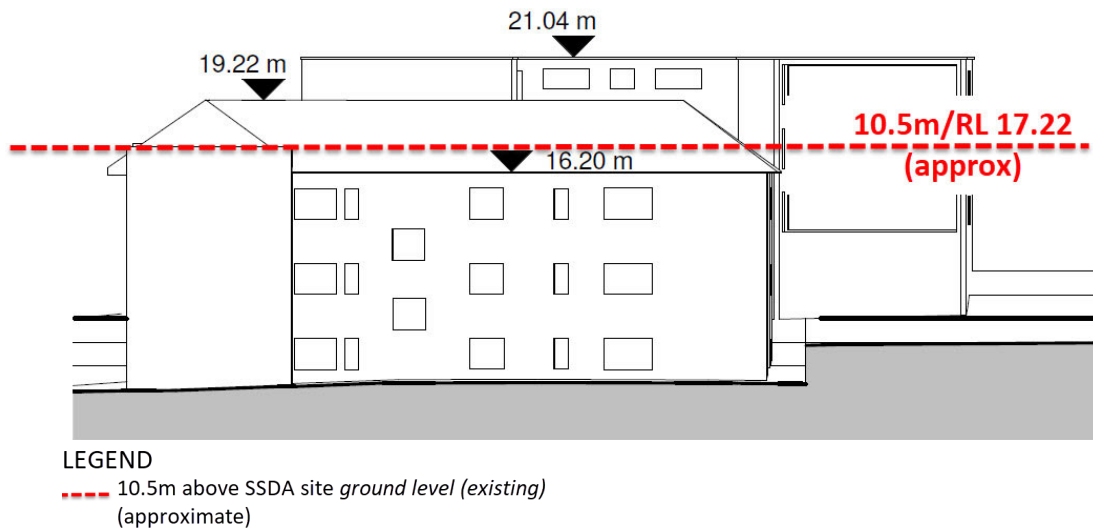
North elevation of 8 Vialoux Avenue showing the height of a compliant building (10.5m/RL17.22) on the SSDA site (Source: Project Surveyors Elevation 7)
